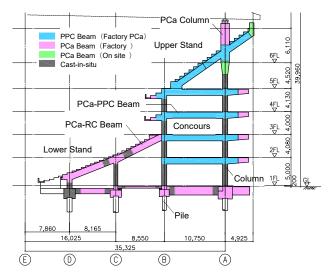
Framing elevation (showing the use of PPC beams and PCa concrete elements)
